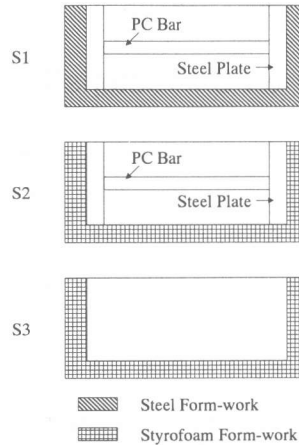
Specimens used to understand expansion capacity of expansive concrete
